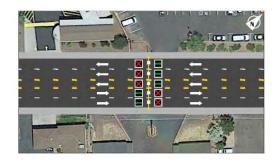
Milton Road System Alternative 2 Cross-Section: Reversible Center Lane
